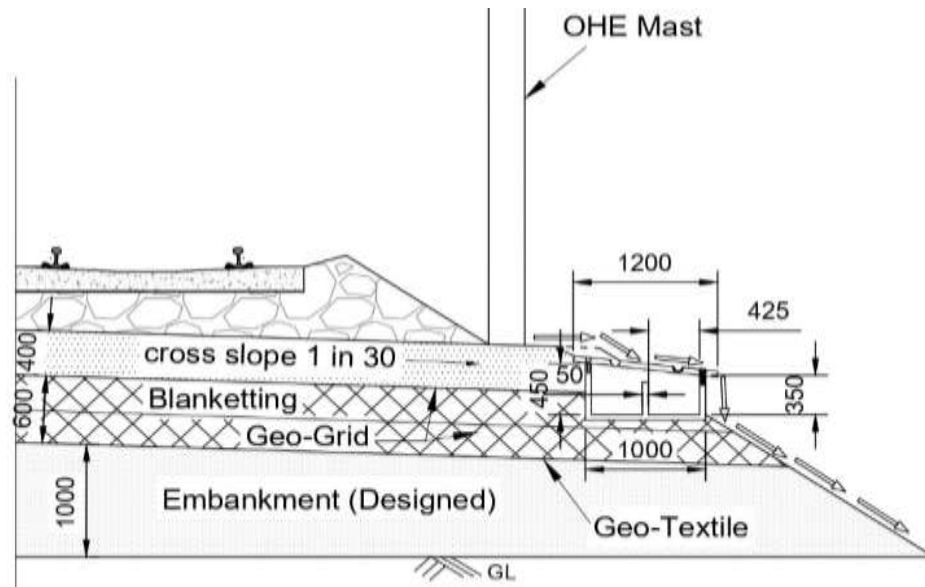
Typical arrangement of signal and power duct on Embankment
